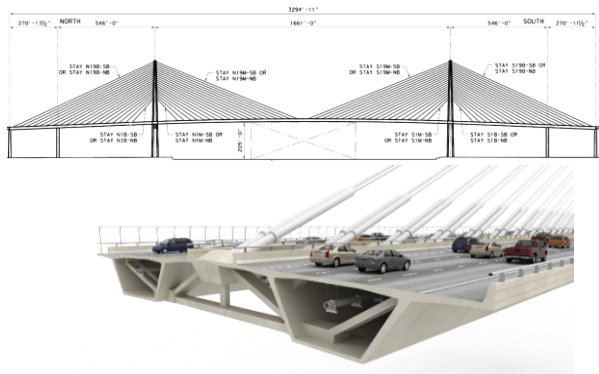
Cable-stayed bridge elevation (top) and cross section isometric rendering (bottom).
